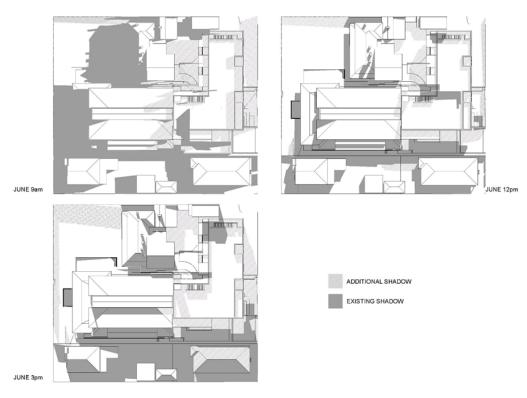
Submitted shadow diagrams showing extent of existing and proposed shadows.Source: FUSE Architecture
